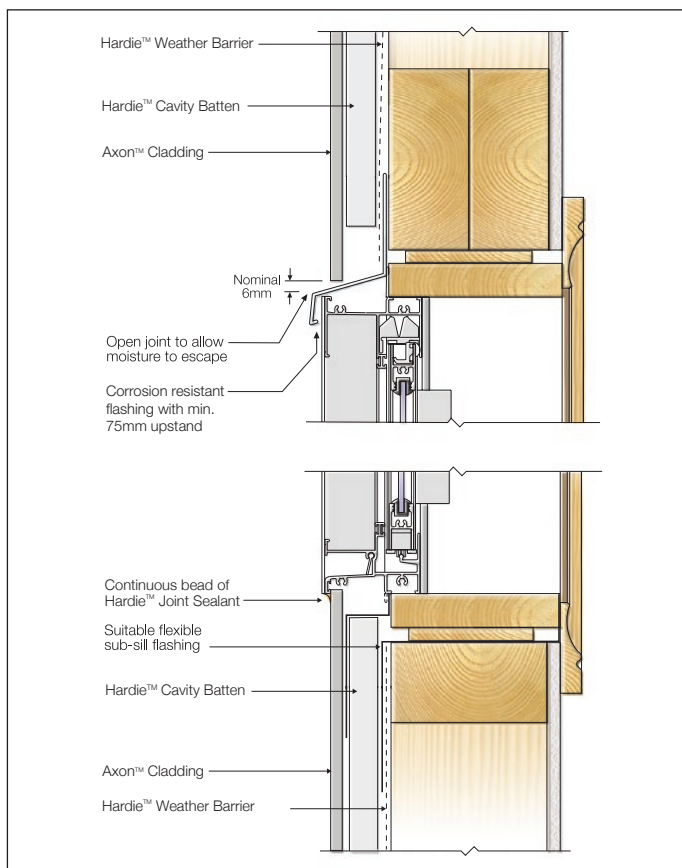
WINDOW HEAD AND SILL - CAVITY BATTEN
